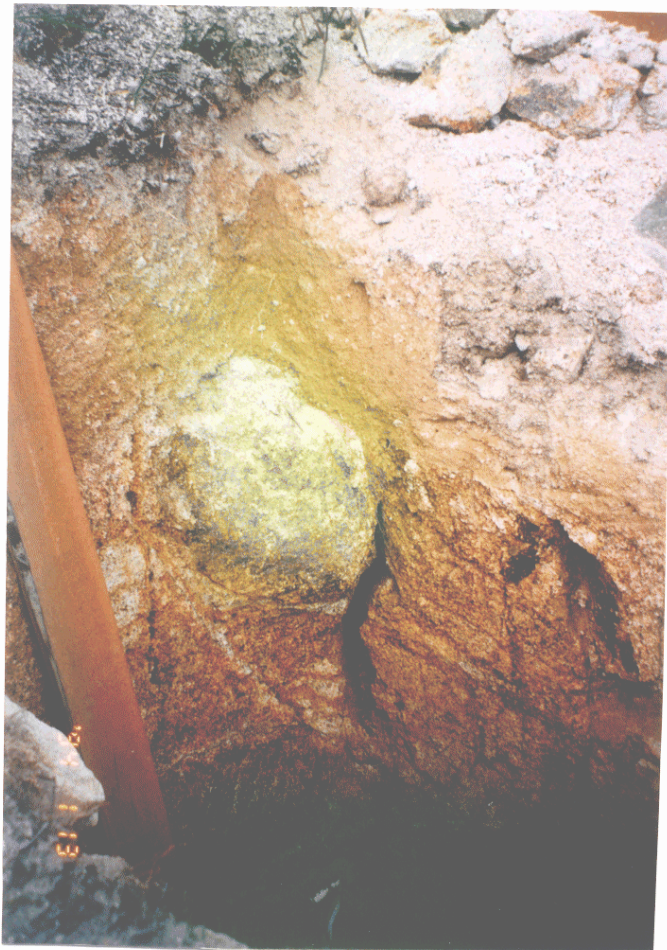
Partially Infilled Open Joints within Trial Pit No. TP9
